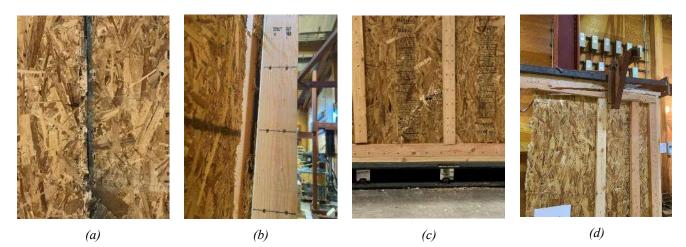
Failure modes of tested Midply shear wall: (a) panel embedment failure, (b) nail failure, (c) panel fracture at corner, (d) faming member split.
